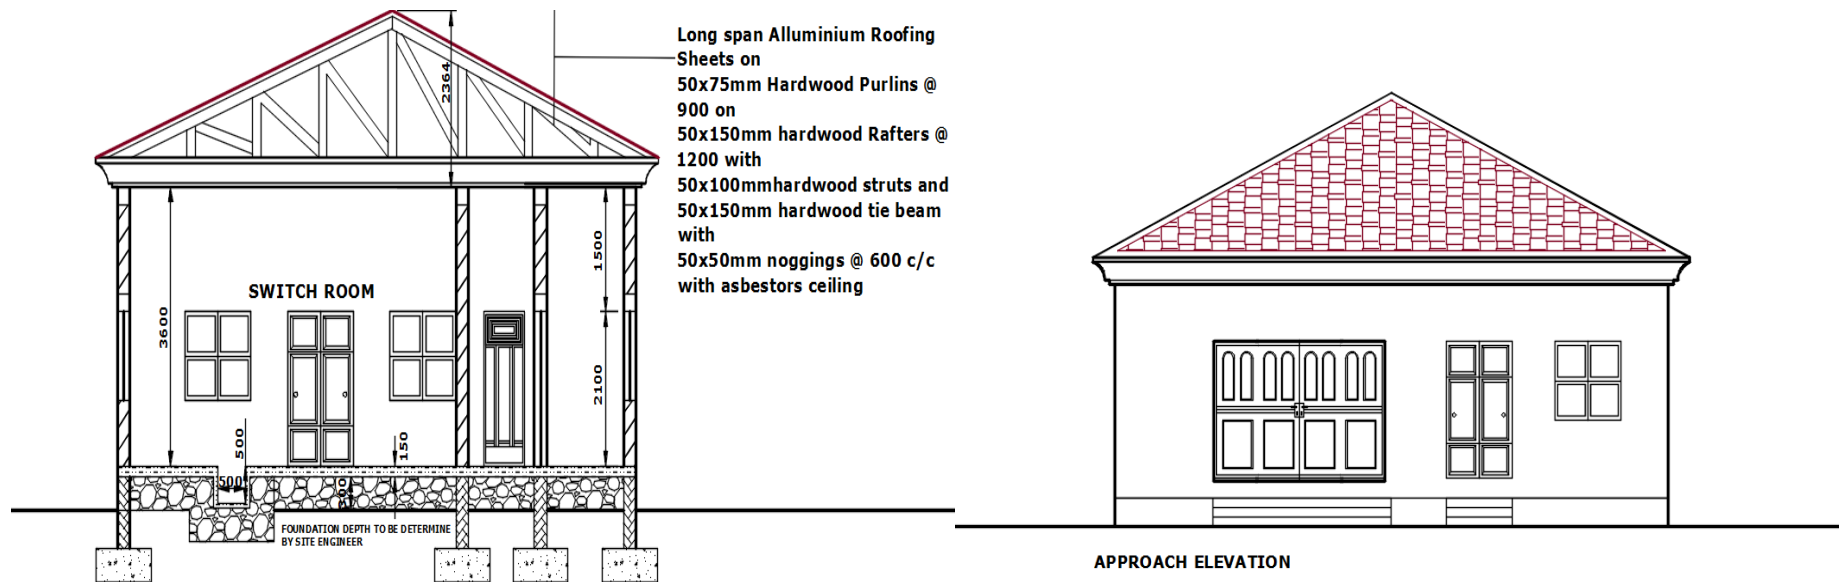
Detailed design of the switch room – approach elevation (all dimensions are in mm)
